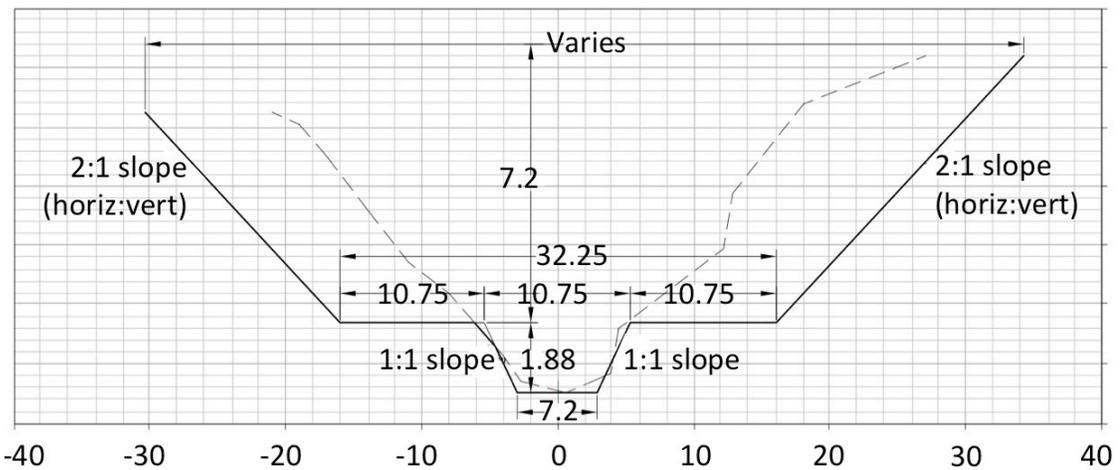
Typical Cross-Section Showing Pre-existing and Two-Stage Channel Design Dimensions. The Existing (Before Construction) Channel Cross-Section is Shown by the Dashed Line. All Dimensions are in Feet. Drawing by Joel Peterson.
